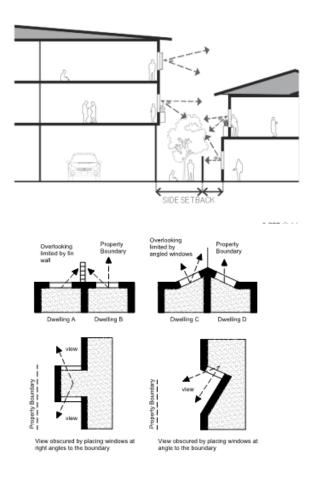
8 — privacy between dwelling units.
